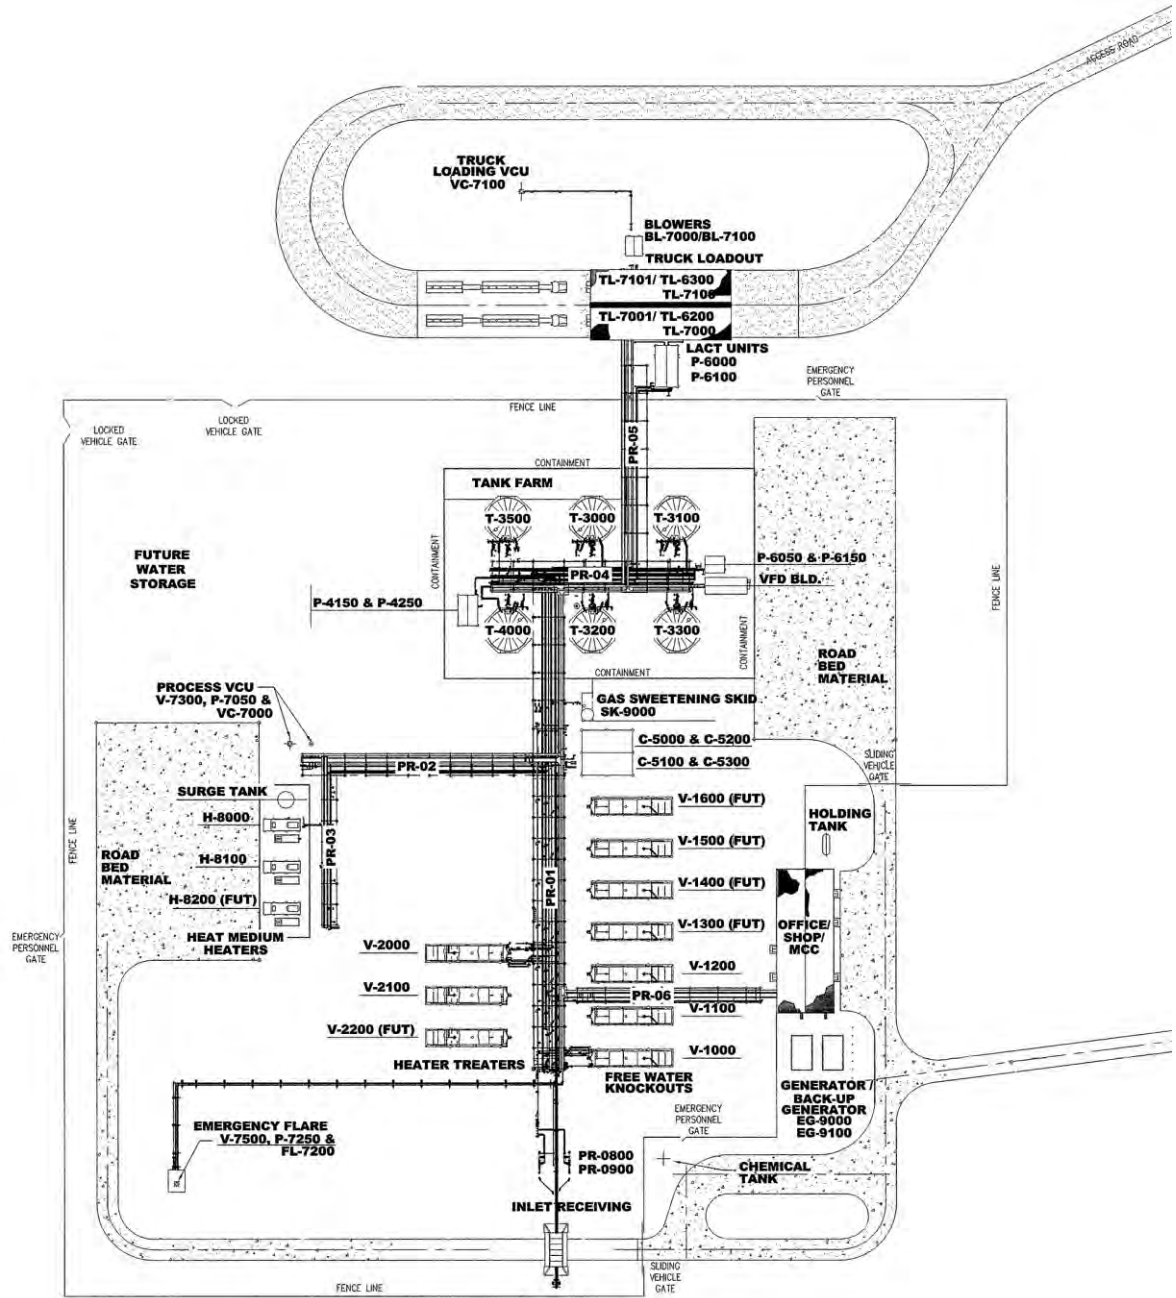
Typical Gas and Oil Separation Plant Layout
